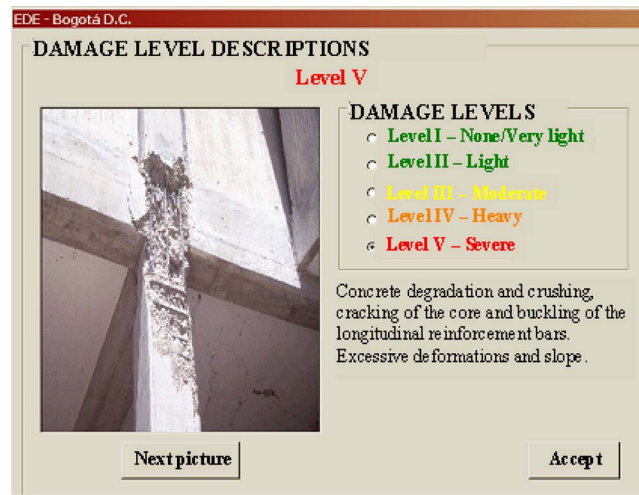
Screen containing the description of severe damage in concrete columns, supporting the evaluation process.
